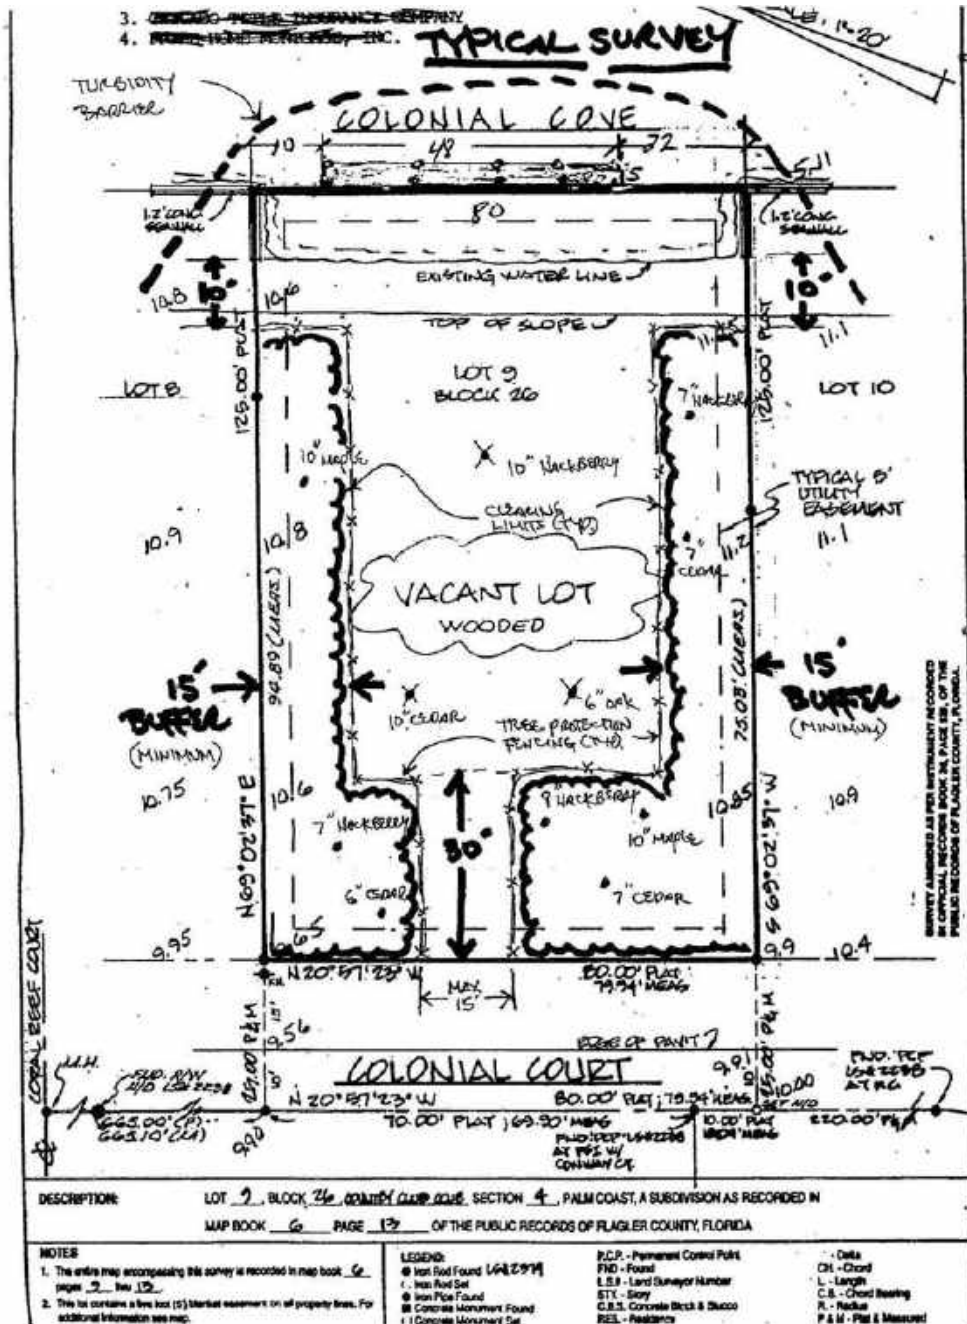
J – Saltwater Canal Typical Seawall Grading Plan
